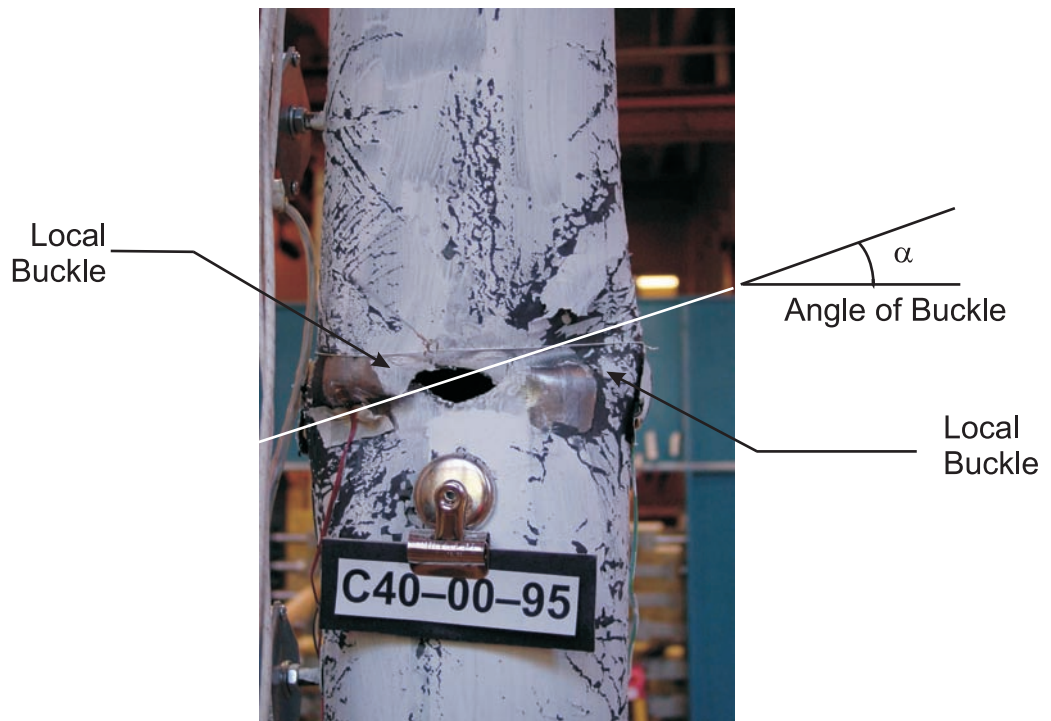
Front View of Local Buckle at Corrosion Patch (Load Step -1), Specimen C40-00-95
